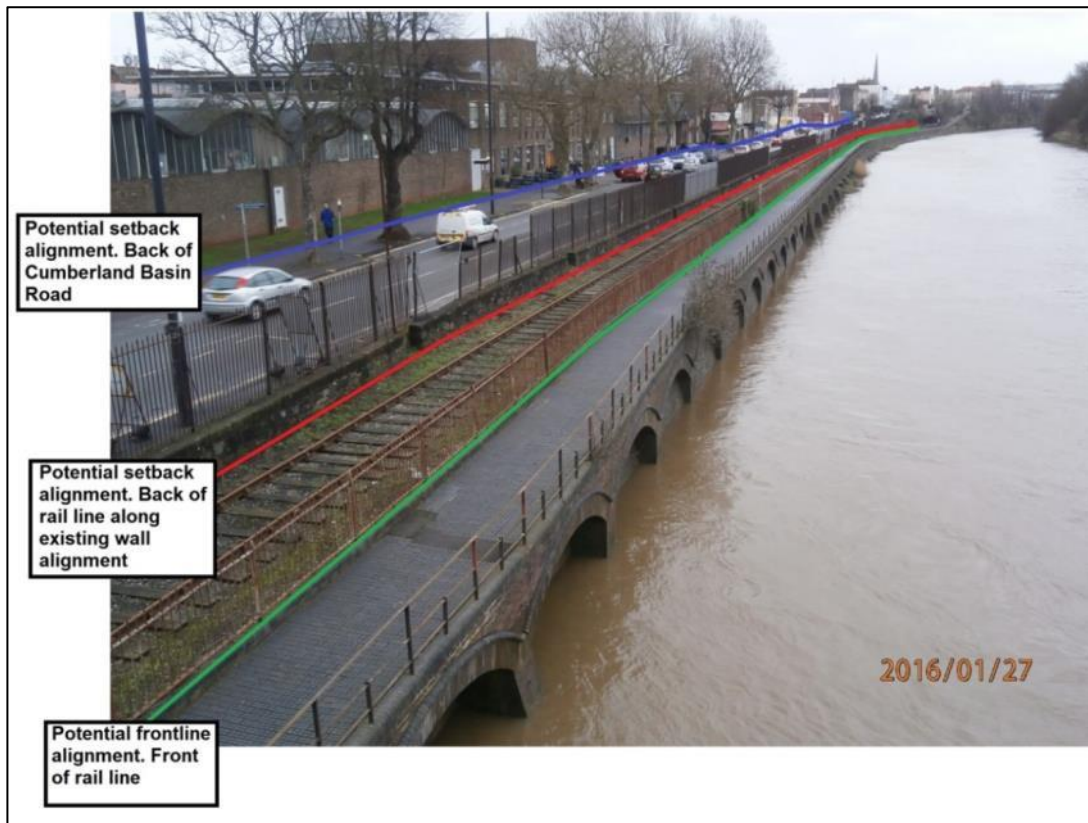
Potential defence alignments at Cumberland Road. Photo looking east along the New Cut
